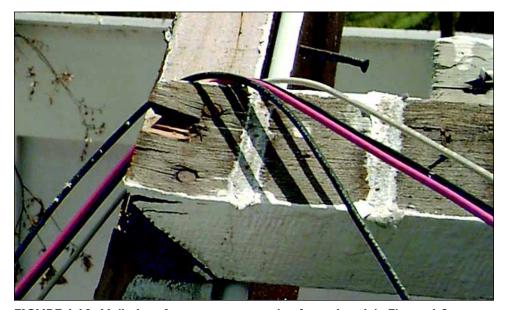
Nailed roof structure connection from church in Figure 4-9.
